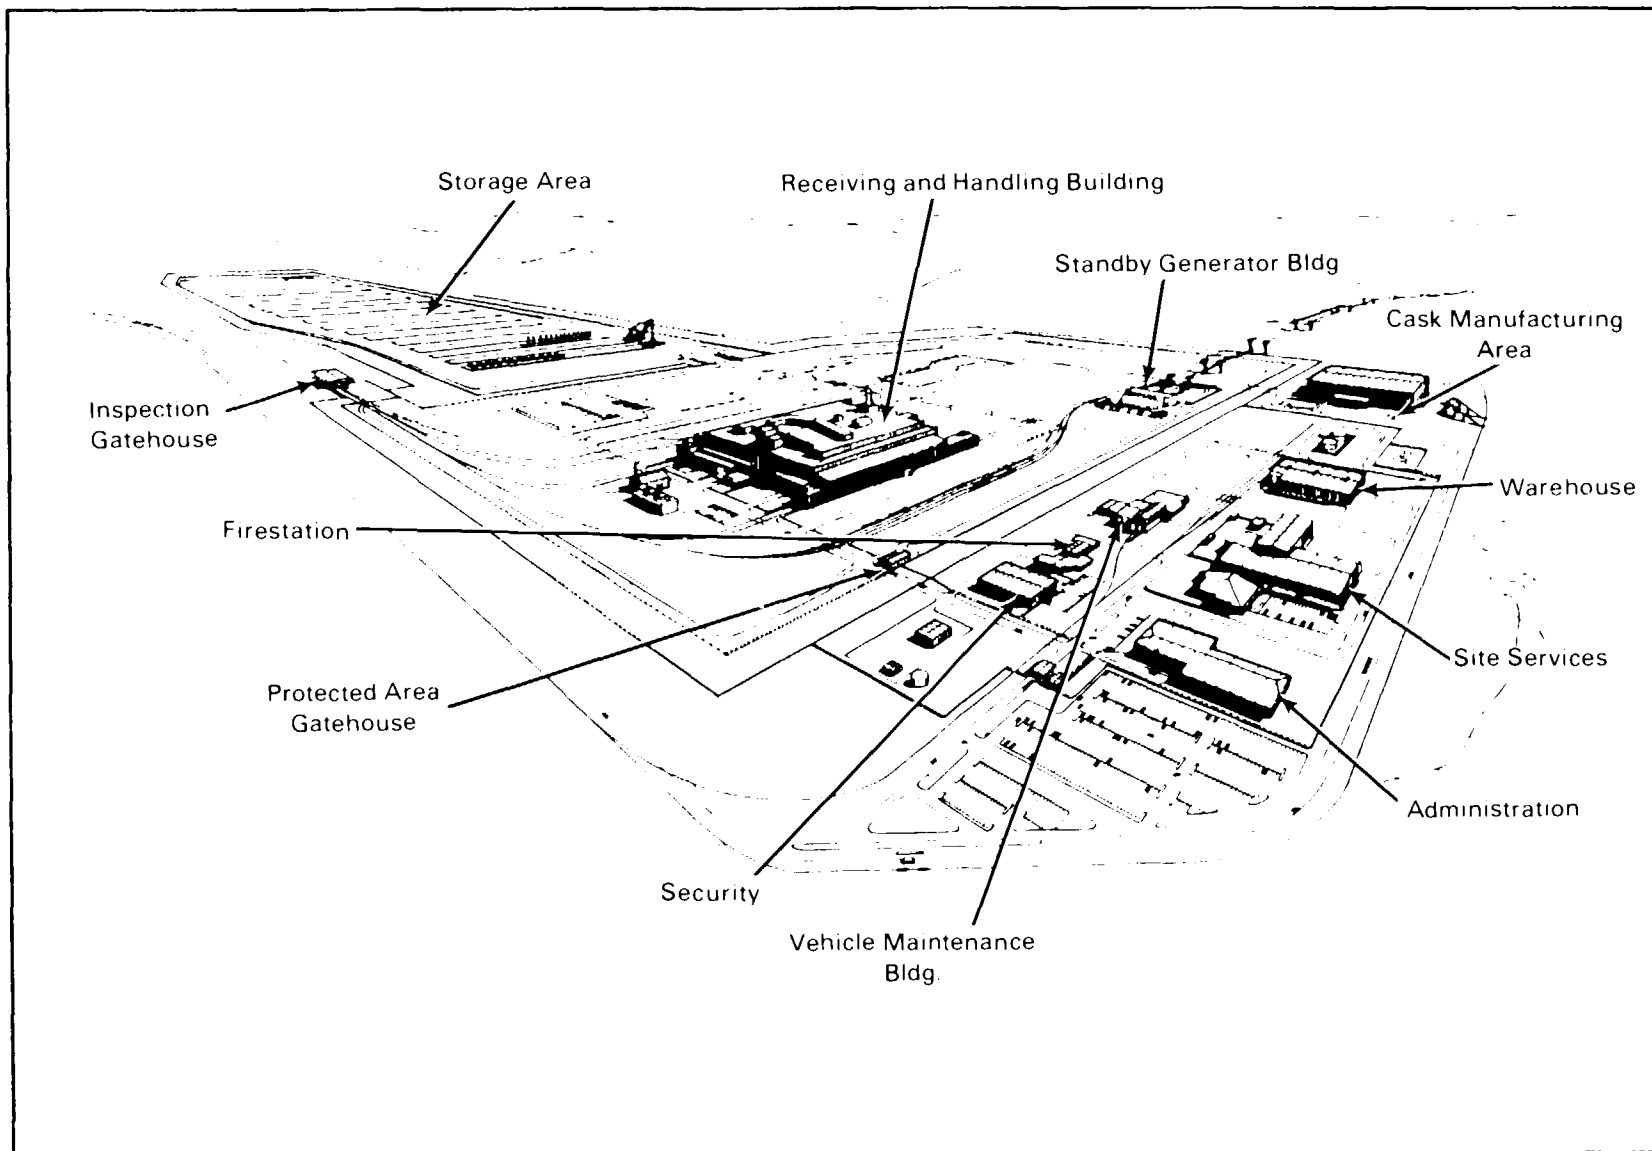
Conceptual drawing of the MRS facility. The principal structure would be the receiving-and-handling building. The storage area is shown to contain a row of upright sealed concrete casks as well as some horizontally stored dual-purpose casks.
